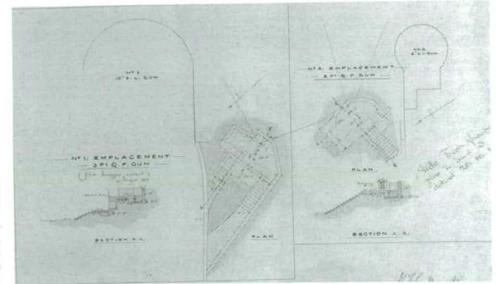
Plan dated 1898 of the two 3-pounder gun emplacements (PRO: WO 78/5141/8)
